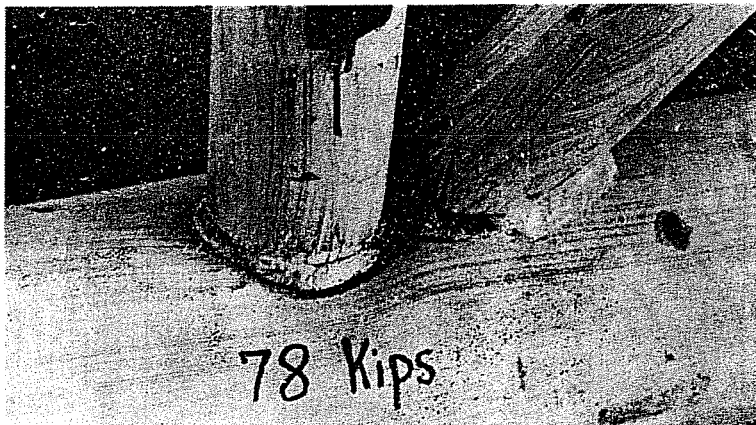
Static load failure in K-joint (series C) with intersecting braces
